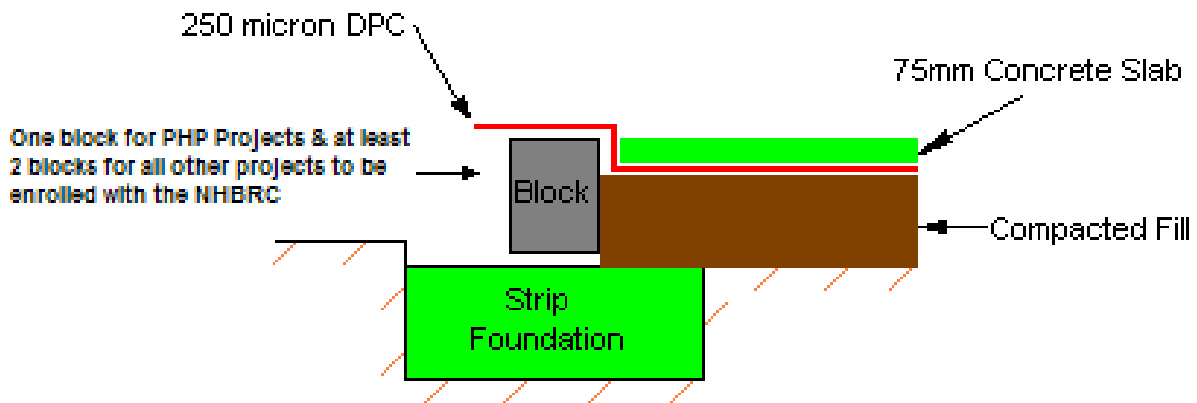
DAMP PROOF COURSE FOR STRIP FOUNDATIONS
